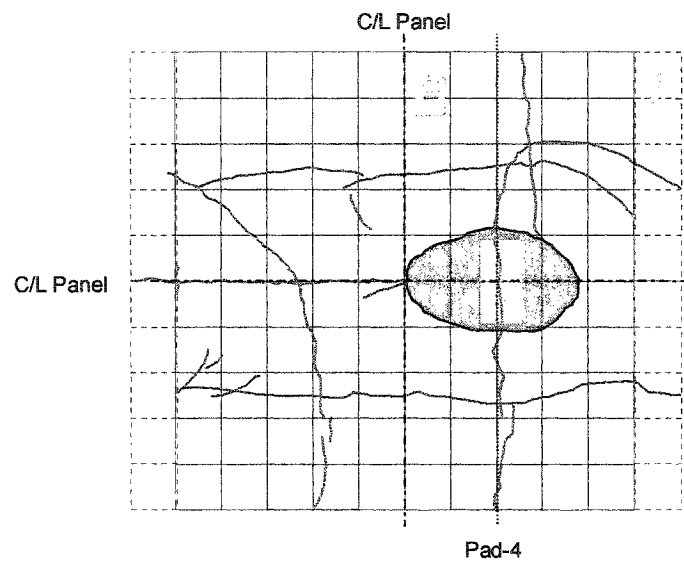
Panel-B: Crack Pattern on Top after Static Failure
